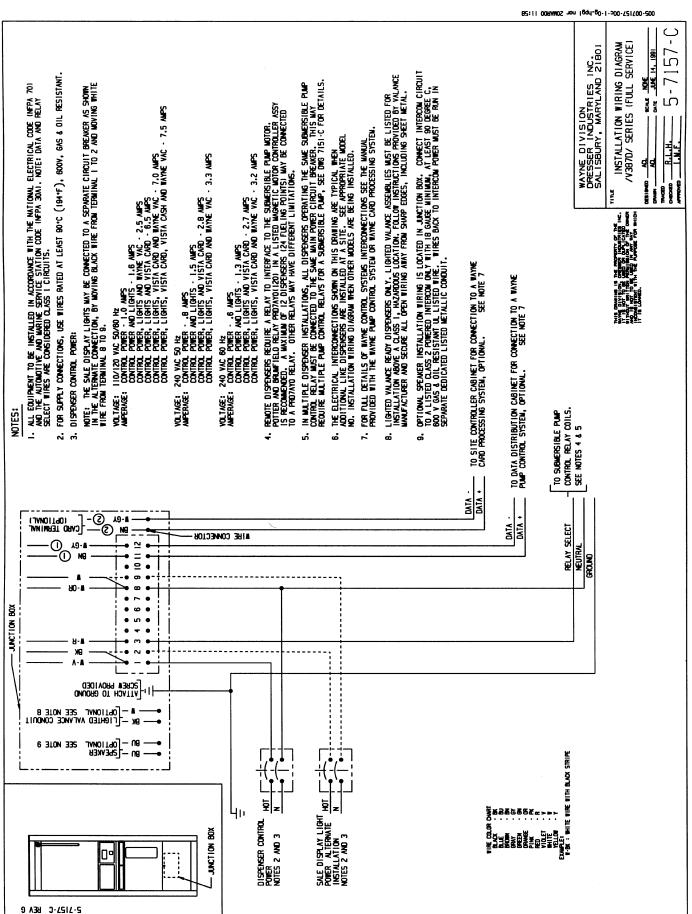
5-7157-C Installation Wiring - 4/V387D (Remote)
